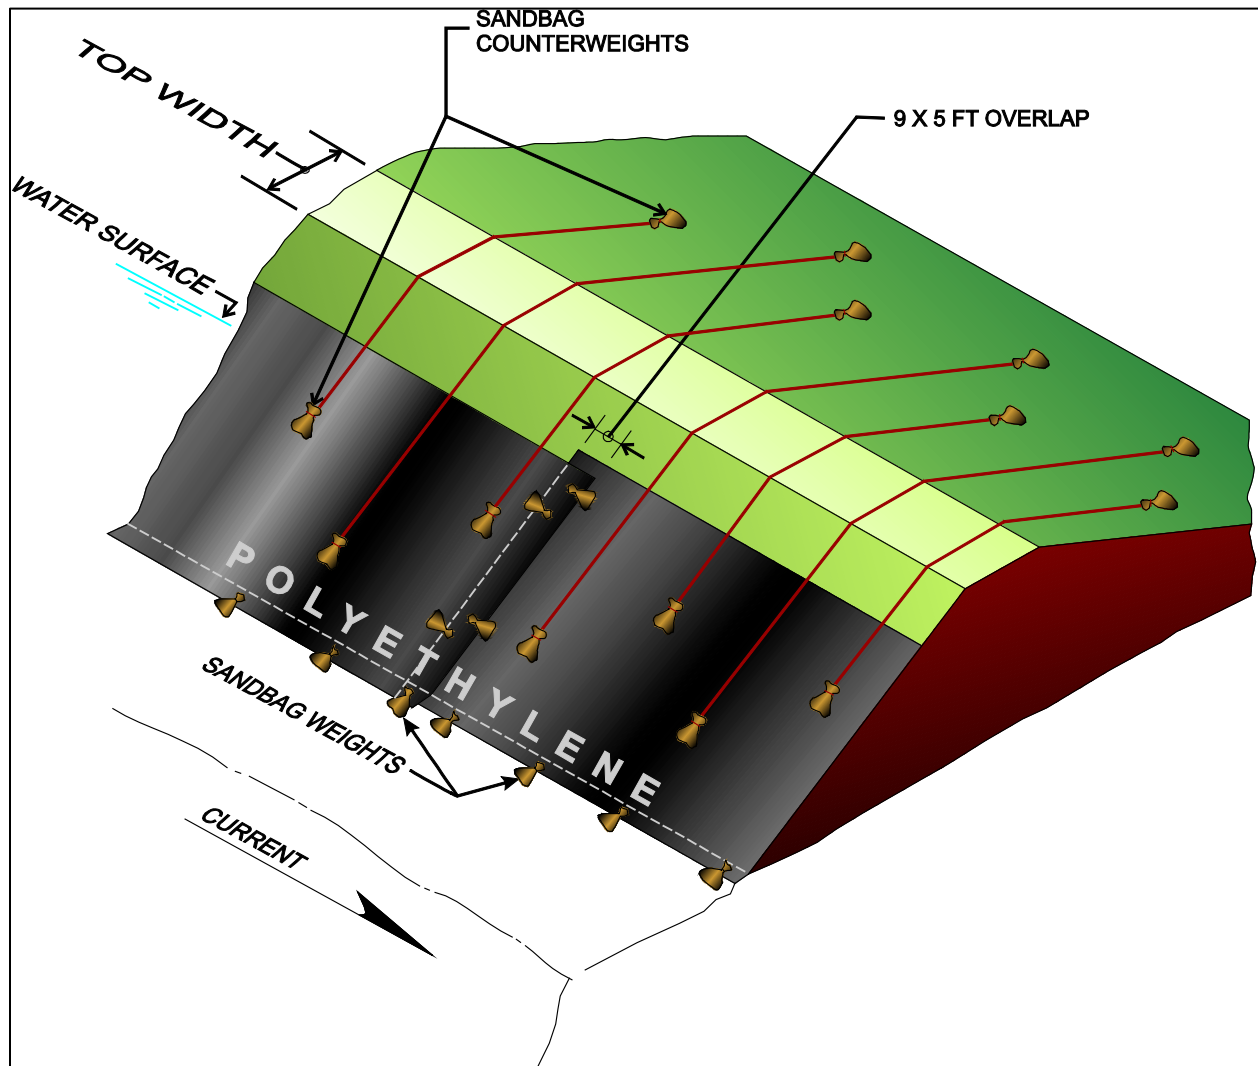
Placement of Polyethylene Sheeting in the Wet.
